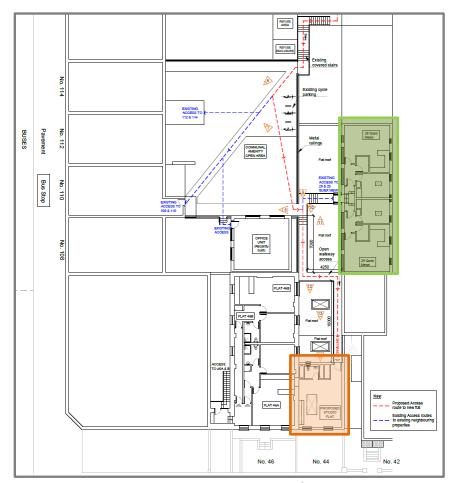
Access Plan to the proposed studio flat (See Plan Ref: 44BR-PP1-07)
